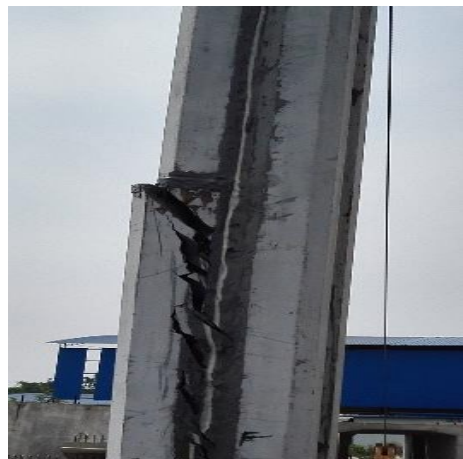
Failure diagram of precast pillar loaded to 2.8 load level
